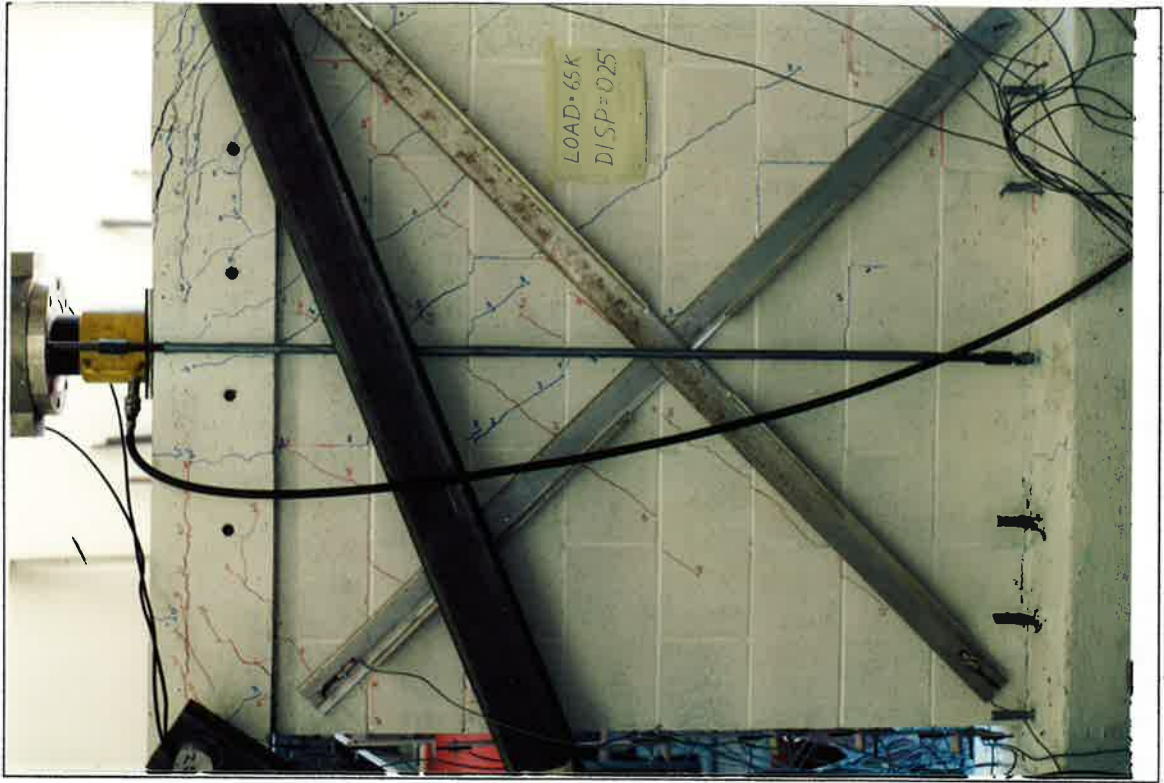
Monolithic Wall At 289 kN (65 Kips) Lateral Load (North Face)
